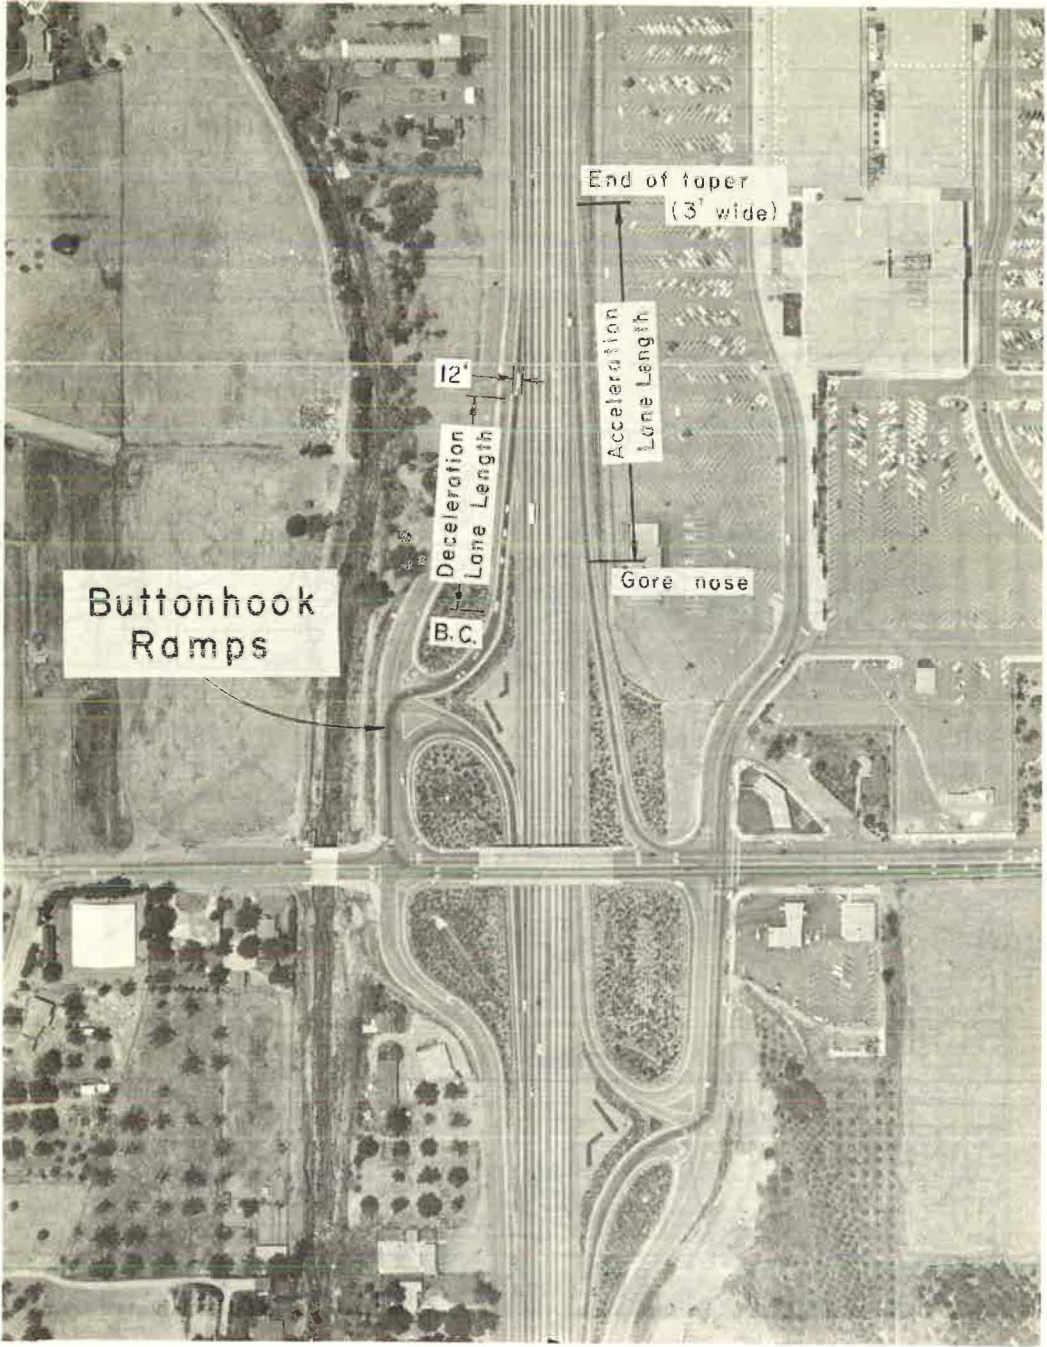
Example of modified diamond ramp and typical buttonhook ramp.
